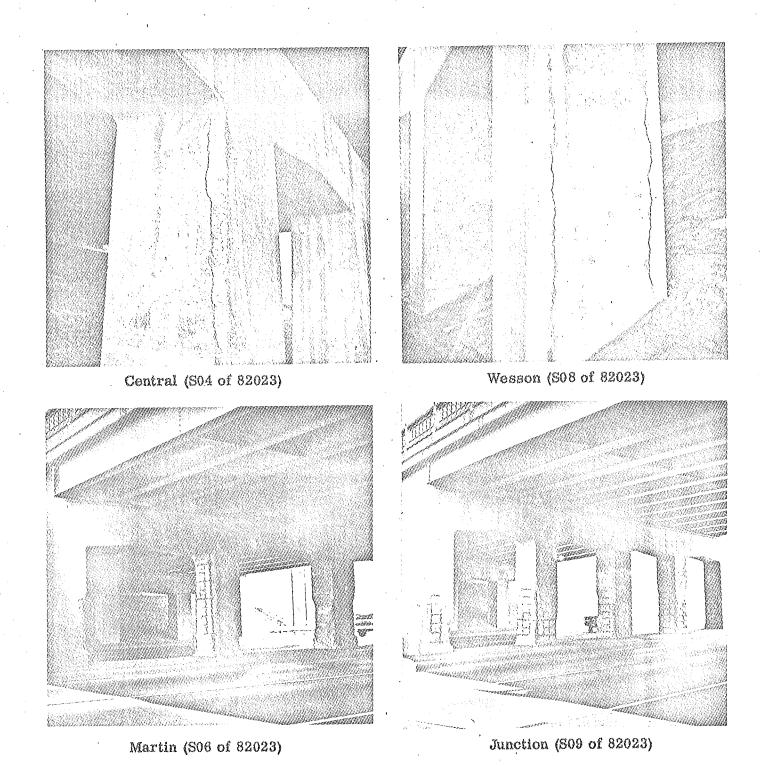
Typical conditions of bridge piers encountered in survey; cracking at pier corners shown upper left and right, and spalling of pier surfaces lower left and right.
